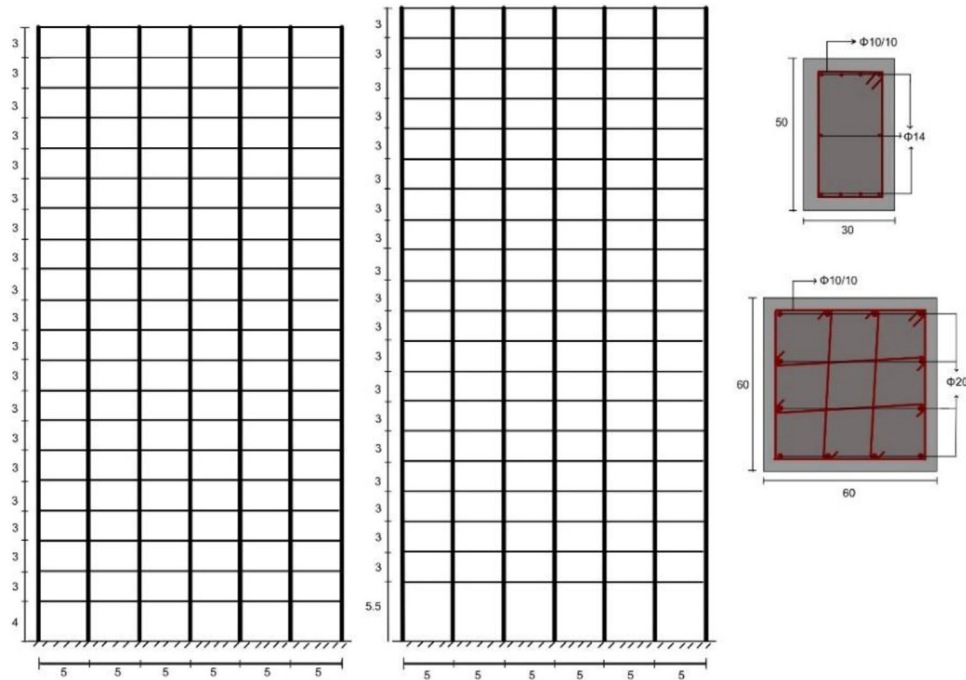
Elevation views of the regular (left) and irregular (right) variants of the 20-story frame and reinforcement details of beams and columns. Structural dimensions in m, section dimensions in cm
